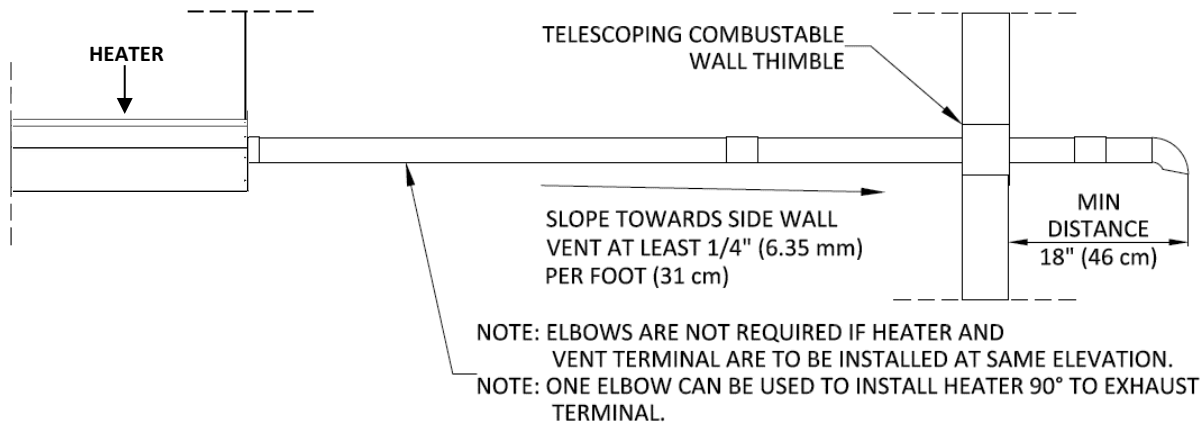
3" SIDE WALL VENTING, SINGLE UNIT
